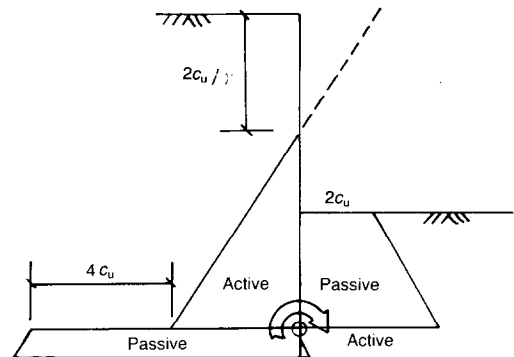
Equilibrium stress analysis for the collapse of a wall in undrained clay with a dry tension crack
